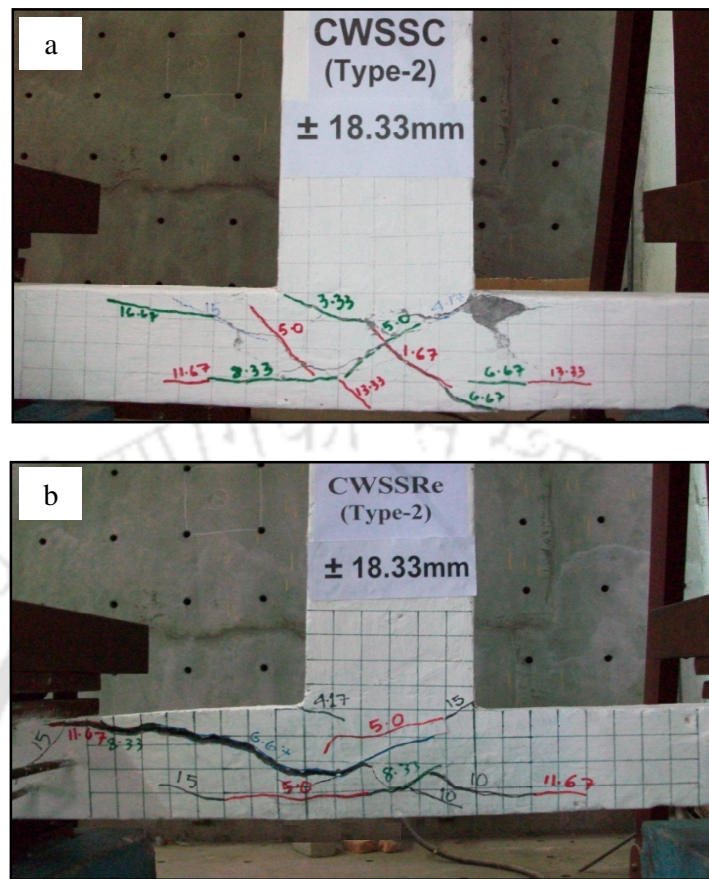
CWSS specimens at the end of test under loading type-2:
